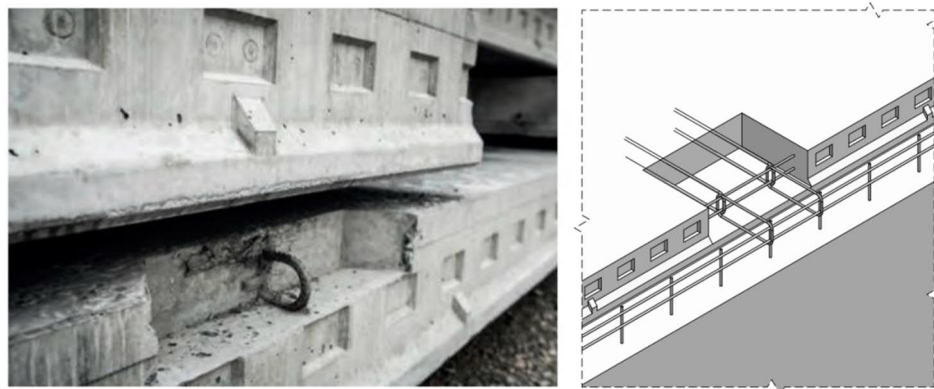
Slab with hammerhead connection (left) and the detail of the hammerhead assembly (right); (Abeo A/S, n.d.)
